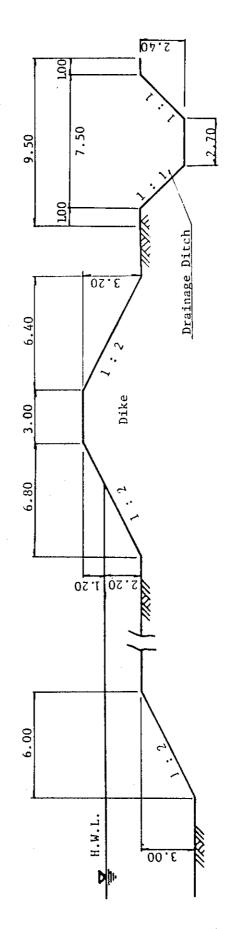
STANDARD CROSS-SECTION OF DIKE (OVERALL PLAN)
